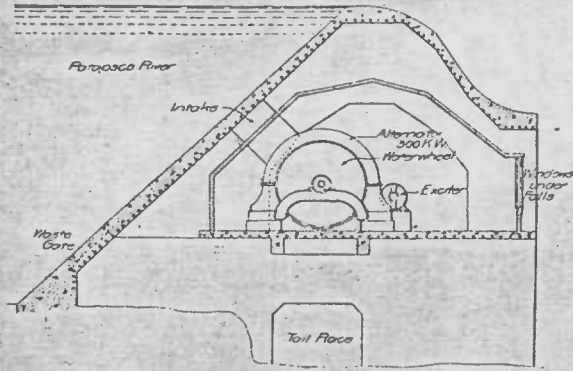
CROSS-SECTIONAL ELEVATION OF DAM.
